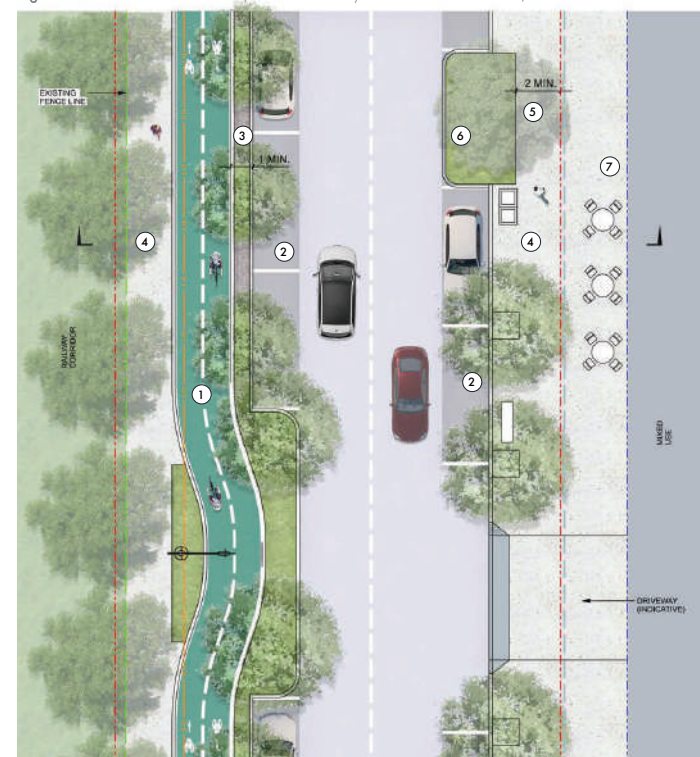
Blaxland Road South (Between Llewellyn Street and Train Station) - Plan
